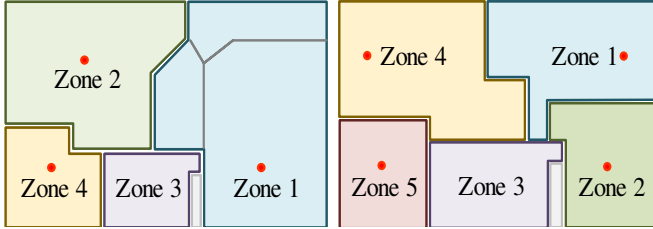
Floor plans on Floors 1–2 (left) and Floors 3–7 (right). Red dots illustrate the multi-sensors existing in this zone.
